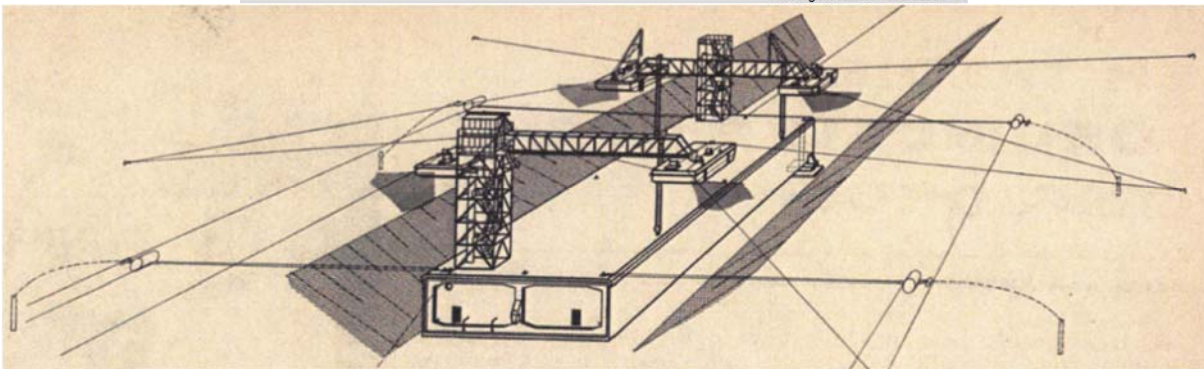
Immersion of tunnel element onto temporary supports.
